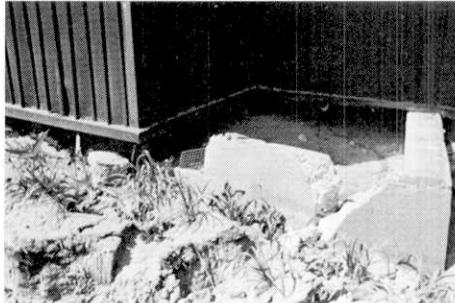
Close up of the damage to the foundation (Gomyoko Wakami-cho).
